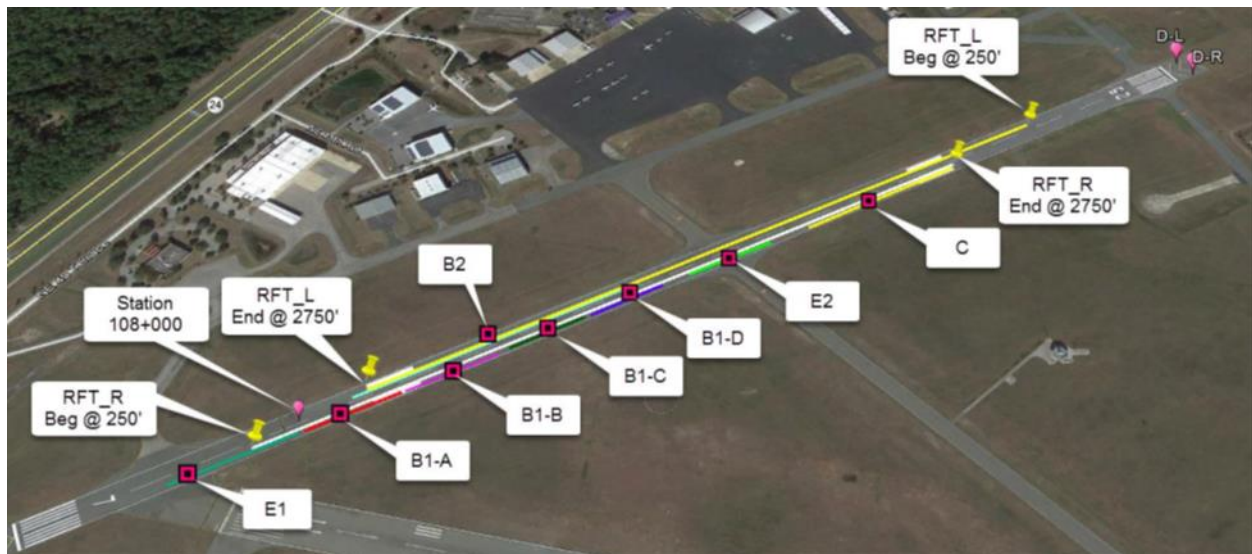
Aerial Photo of GNV Runway 7/25 Test Sections
